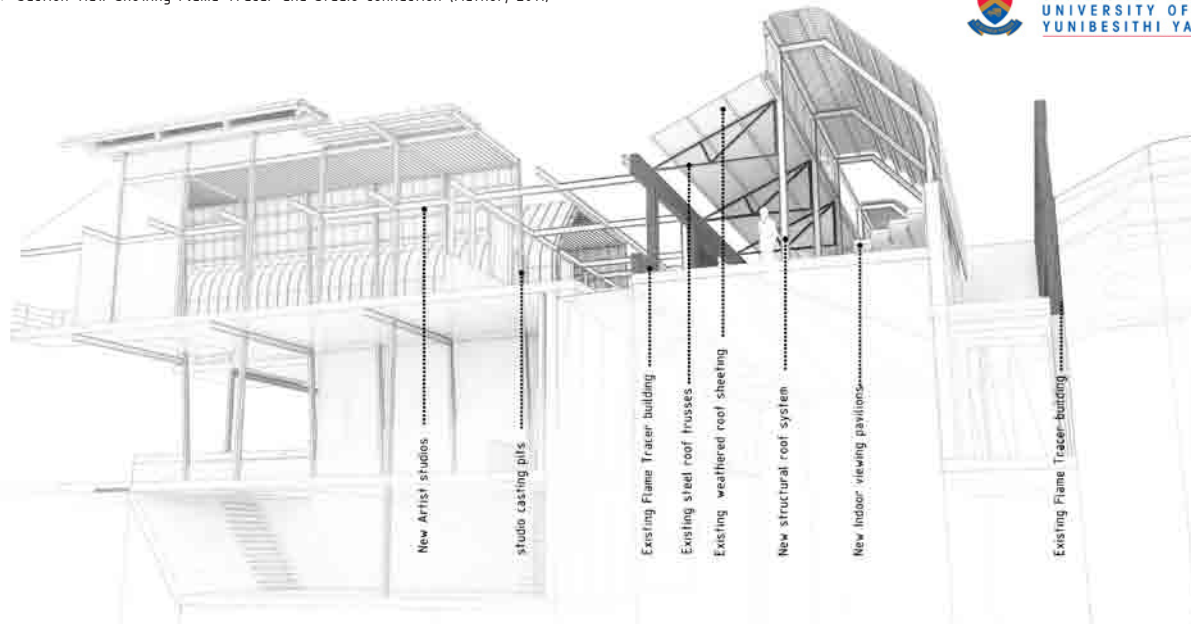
Section view showing Flame Tracer and studio connection (Author, 2011)
